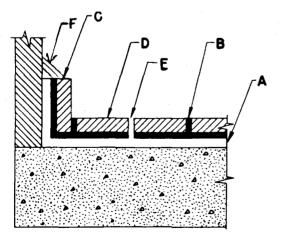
Acid-proof brick floor with impervious interliner. (A) 1/4-in. asphalt interliner with glass cloth reinforcement and concrete primed with asphalt primer; (B)properly selected, chemically resistant 1/8-in. mortar side and bottom joints; (C) cover brick or "soldiers"; (D) acid-proof brick; (E) properly selected, load supporting-type expansion/contraction joint at $\frac{3}{8}$ in. wide; (F) cap with mortar or expansion joint sealant to assist drainage.
